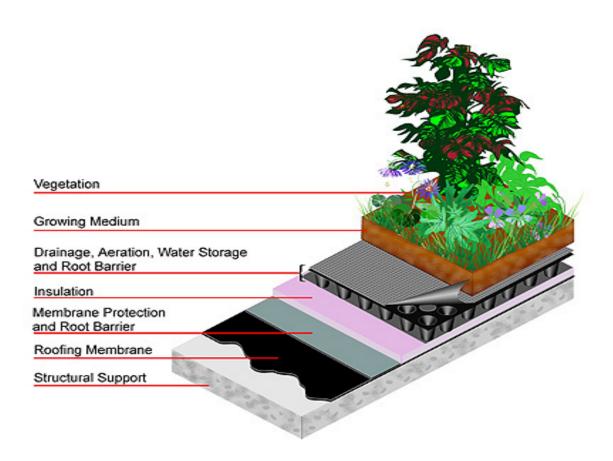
Green Roof Components (American Wick Drain Inc., 2003).
